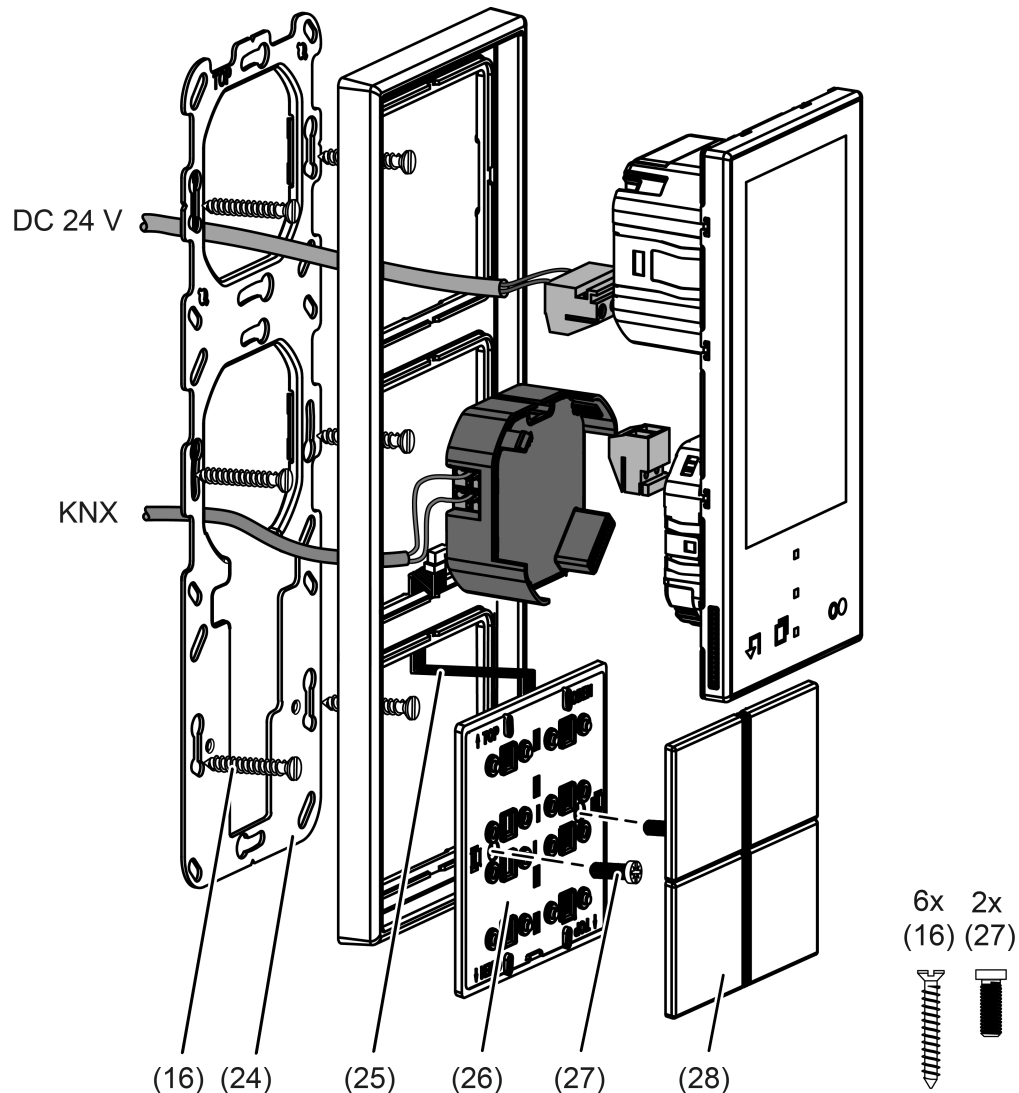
Device fitting with push-button extension module with 3-gang supporting frame
